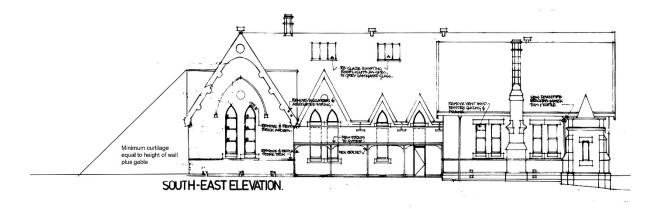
Part 7: Minimum curtilage allowance to another single storey structure to rear of former school building
